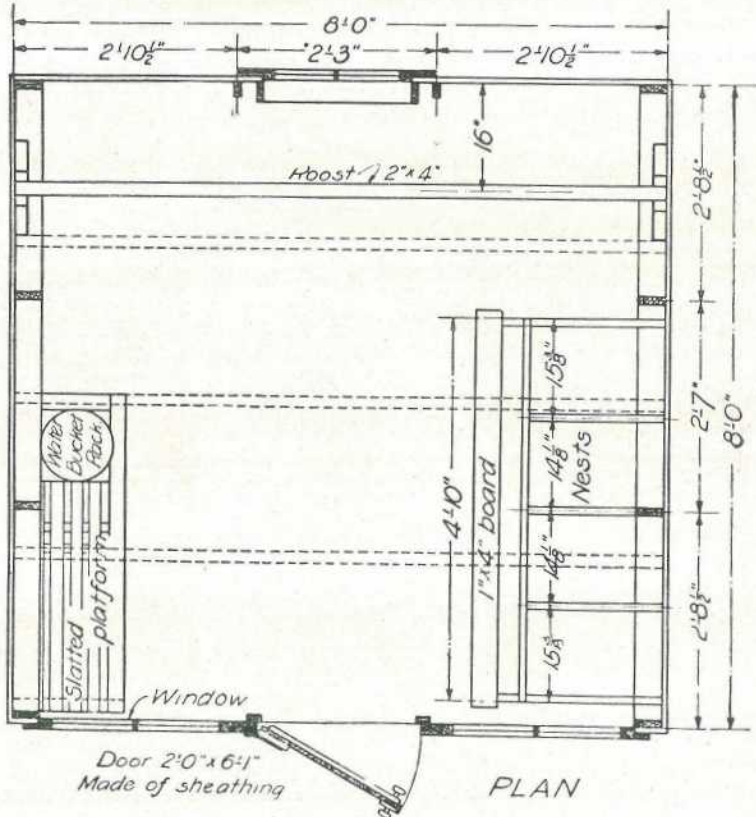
Floor plan of house shown in Fig 10 when used for laying hen .
